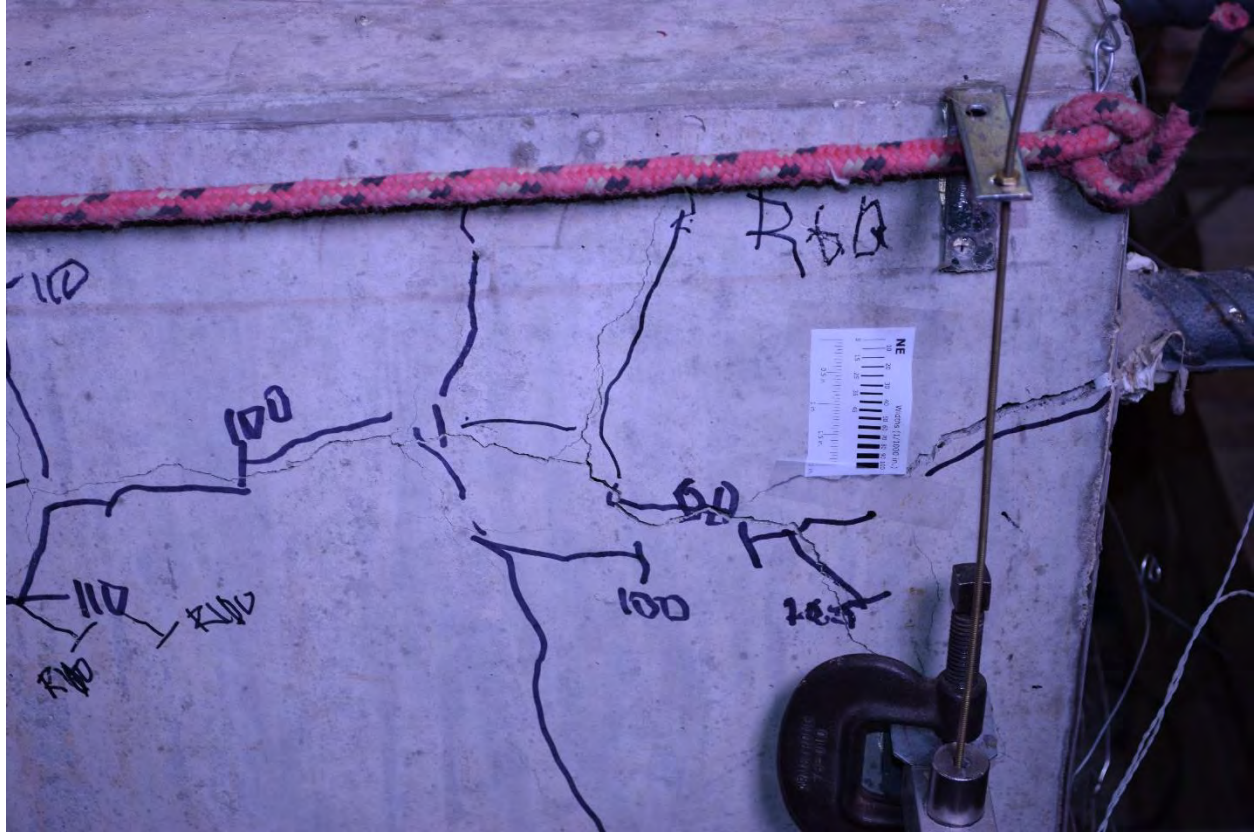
Test Photo Specimen D16, NE corner, 120 kips
